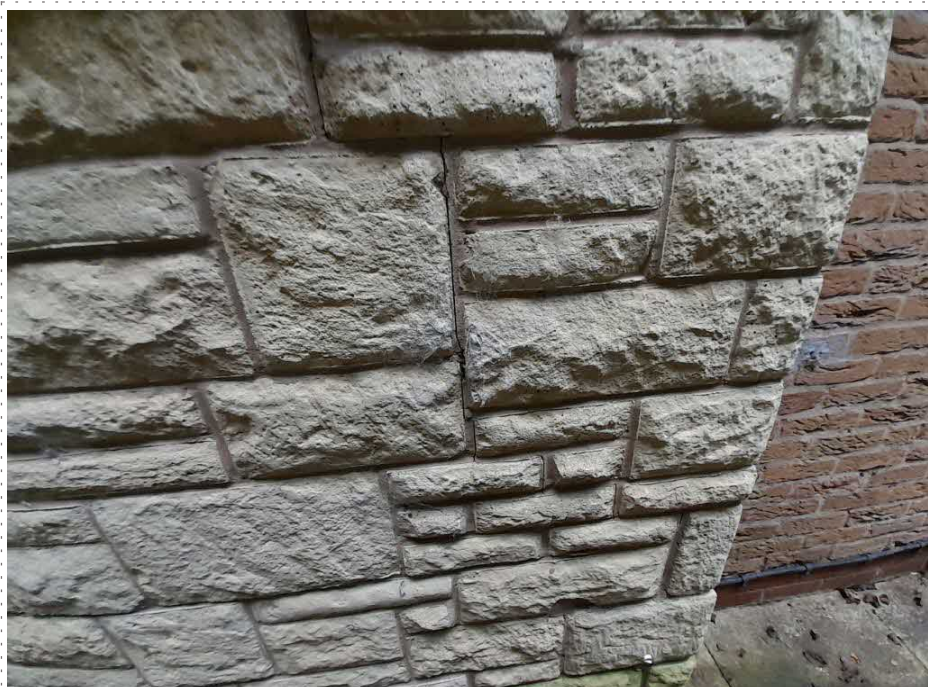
Stepped cracking below single-storey right-hand elevation window (utility).
